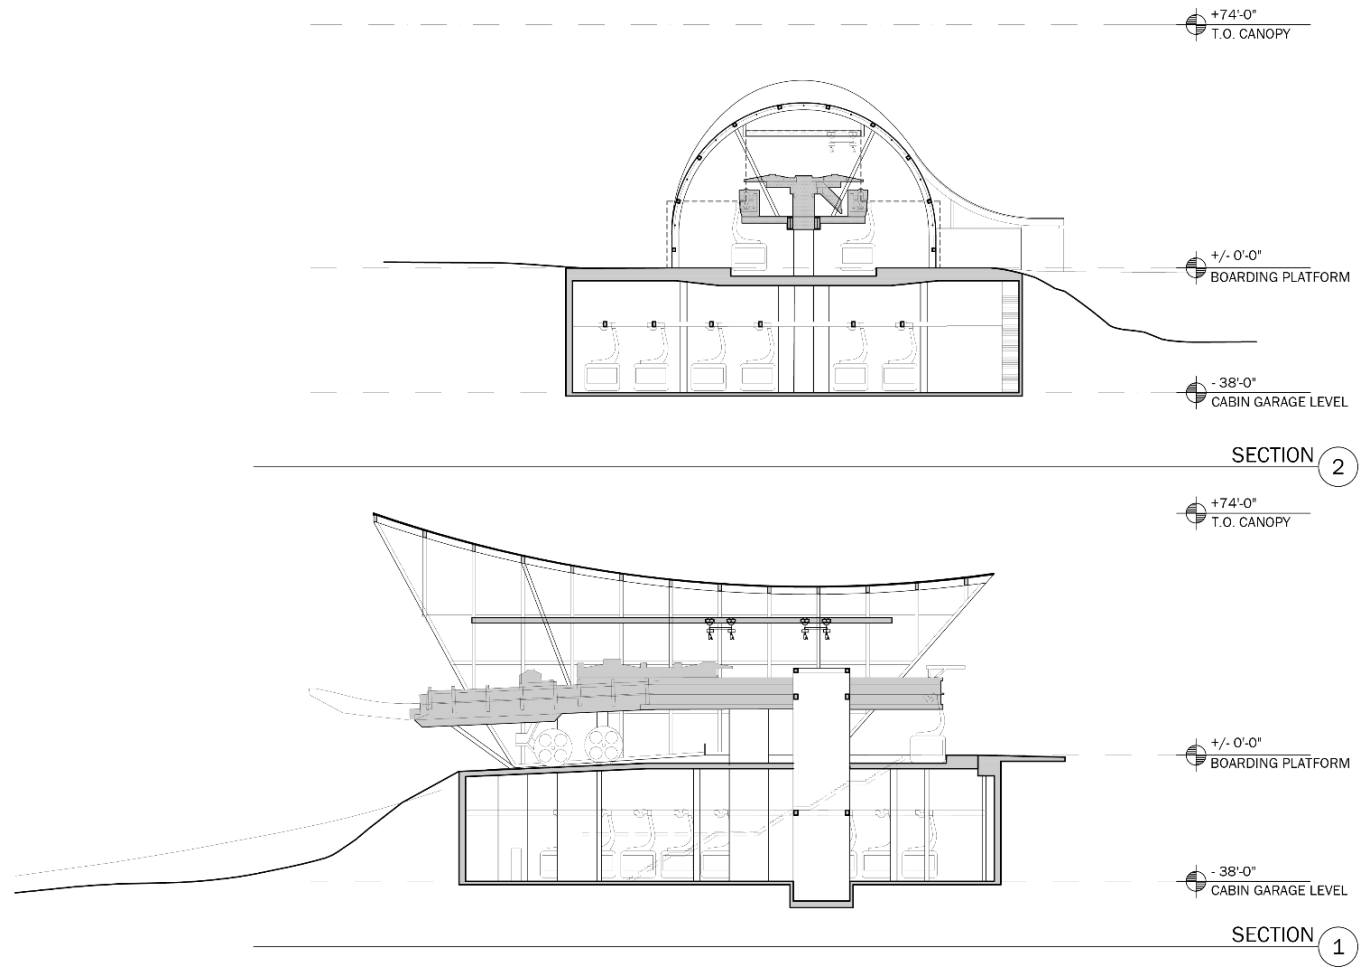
2-25: Dodger Stadium Station Cross Sections
